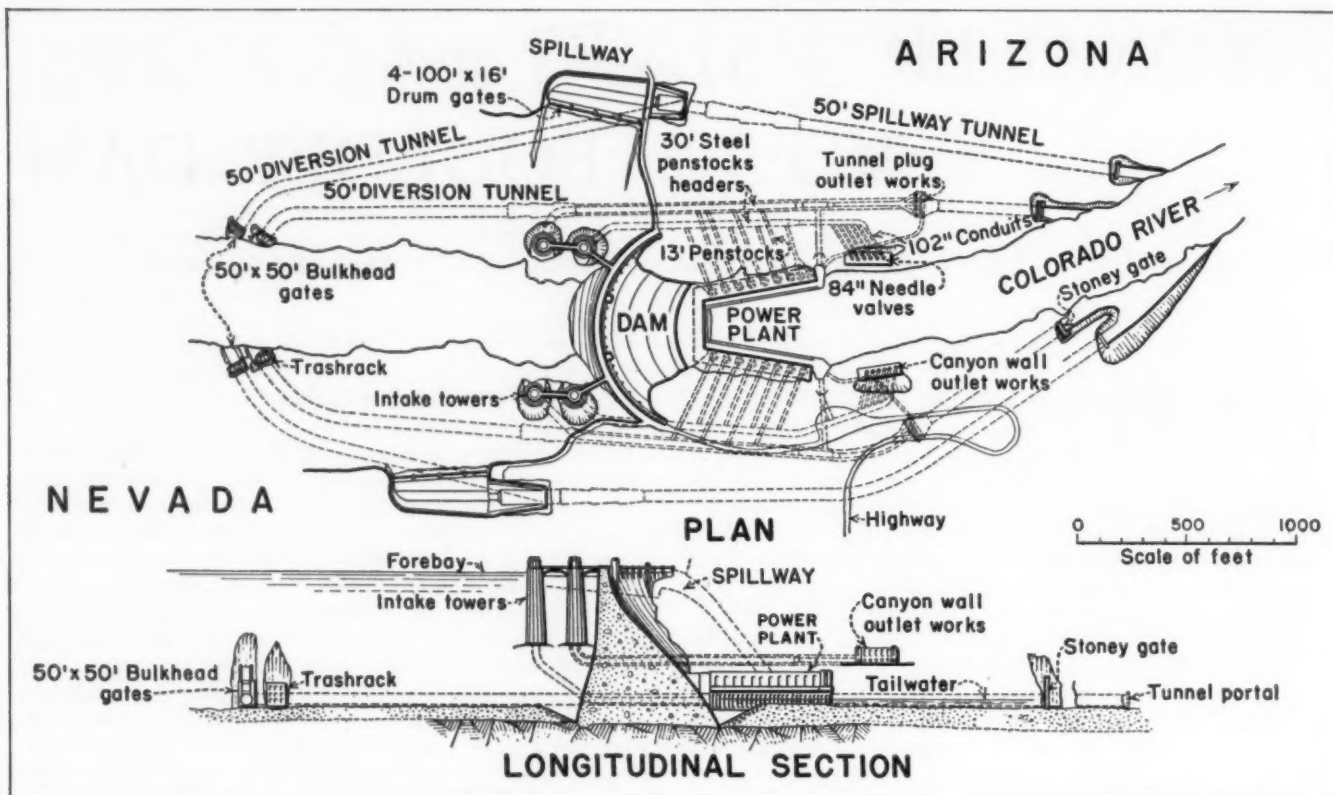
GENERAL LAYOUT OF BOULDER DAM AND ASSOCIATED WORKS SHOWING LOCATION OF THE BULKHEAD GATES
